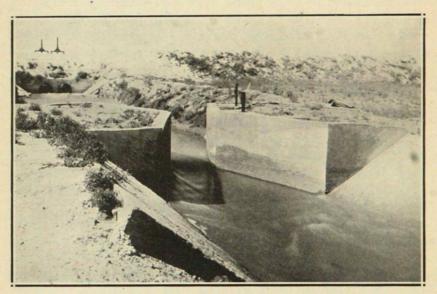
PLATE I.—Field Installation of Three Foot Concrete Venturi Flume of Rectangular Cross Section.
